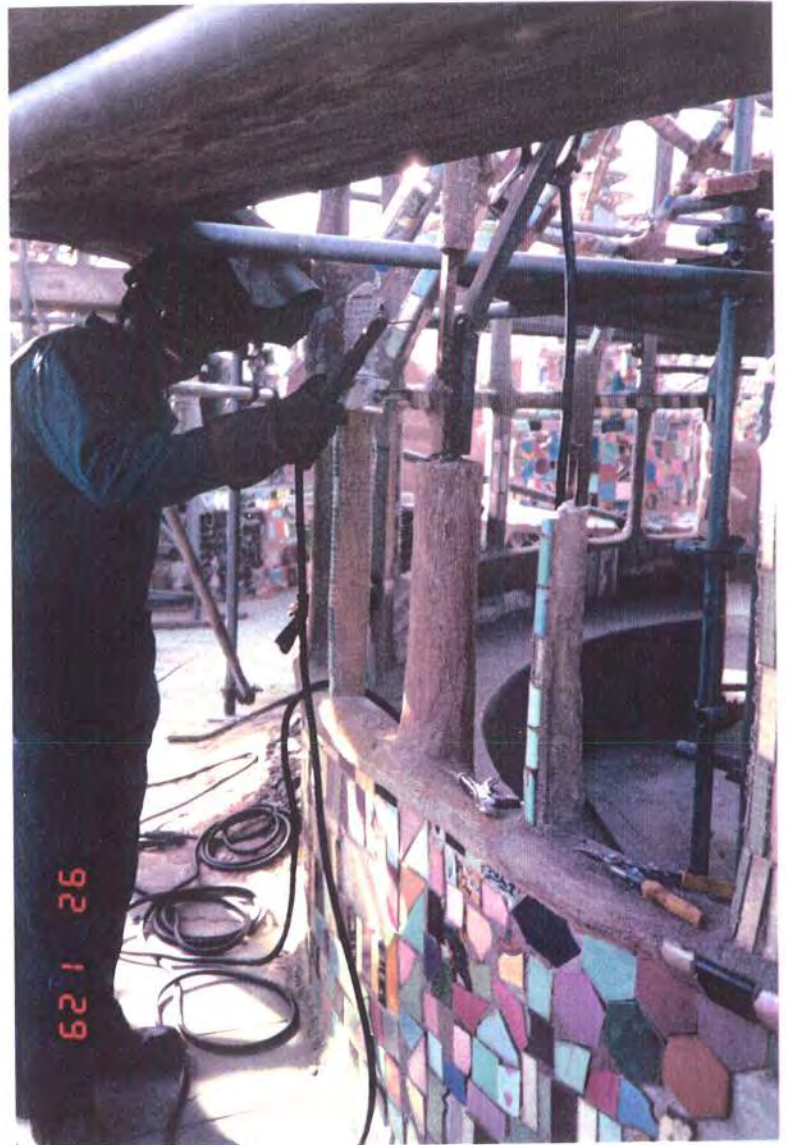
Welding lower attachment of second 'T' section support to outer vertical steel reinforcement, January 1992.
